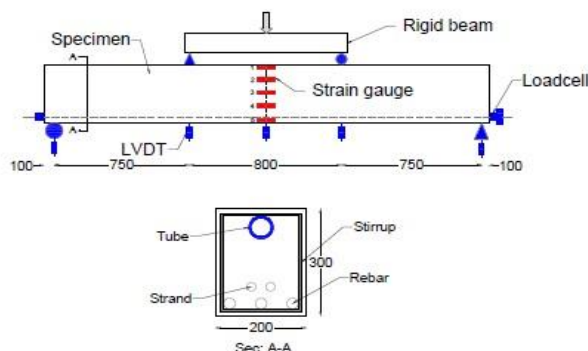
Overview of test arrangement and dimension of test specimens (unit: mm).
